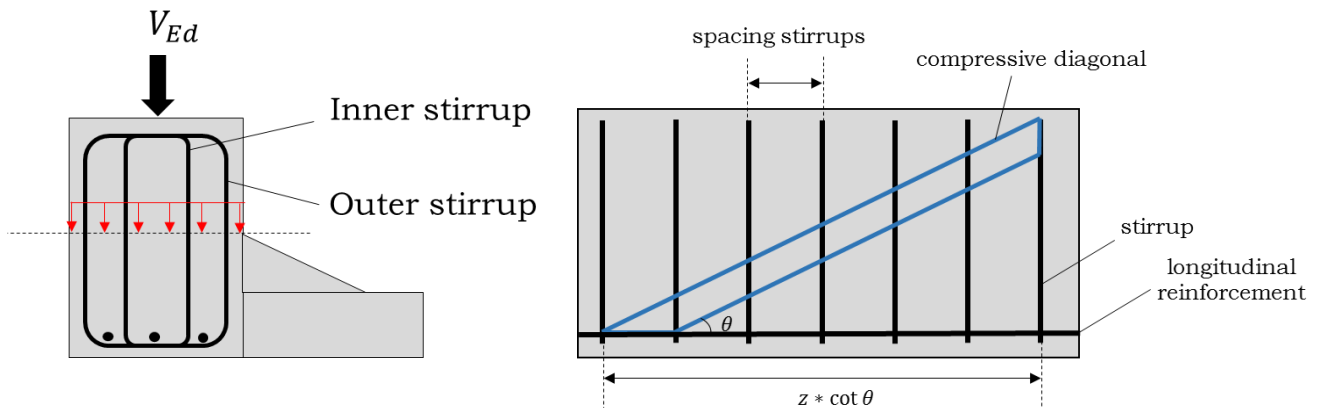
Shear stress in the girder (left) Compressive diagonal intersects multiple stirrups (right)
